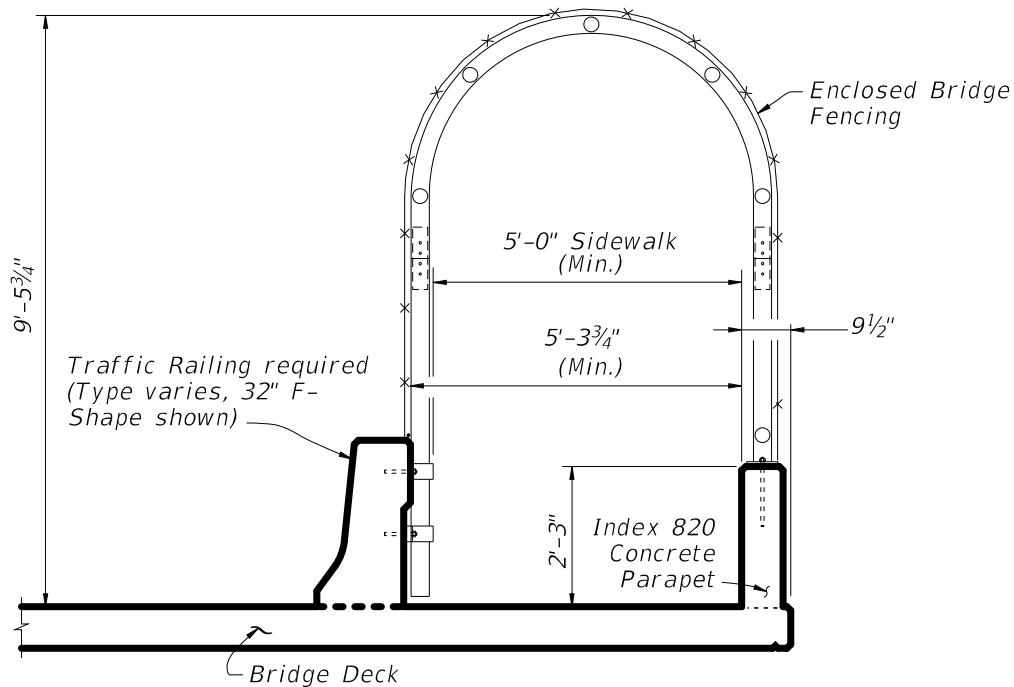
Bridge Railing – Enclosed Fencing
